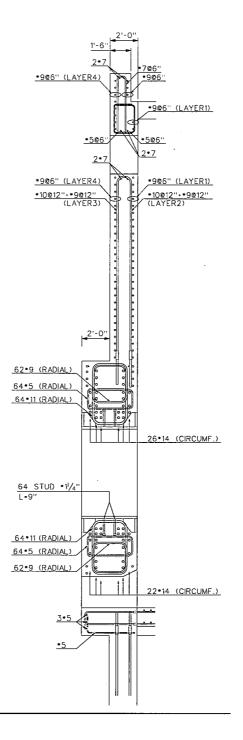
Concrete Reinforcement in Wall 11 (Sheet 3 of 3)
